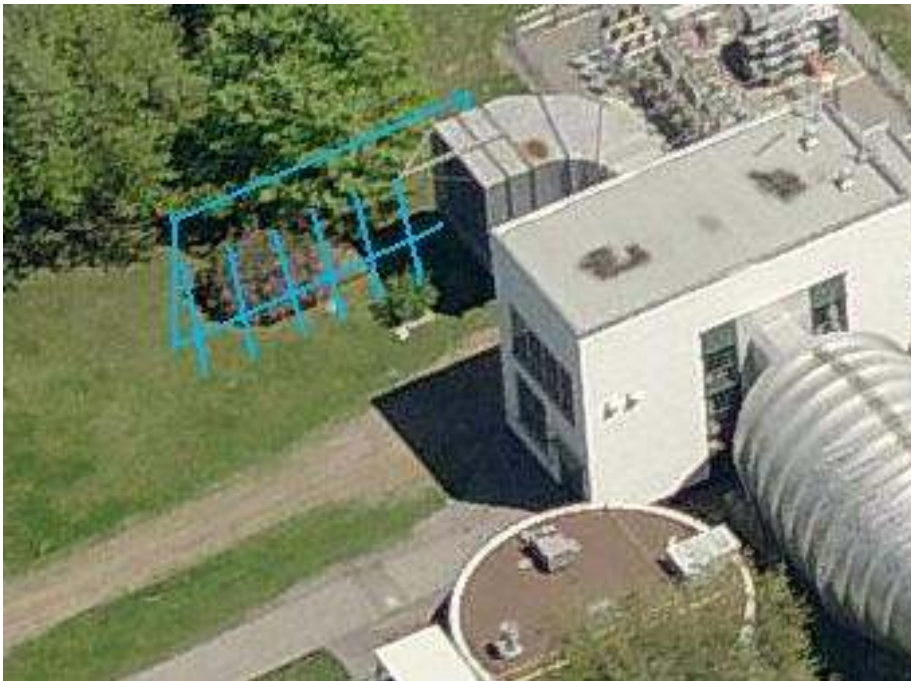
M46 Wind Tunnel Exhaust Barrier Wall – Concept View 2.
